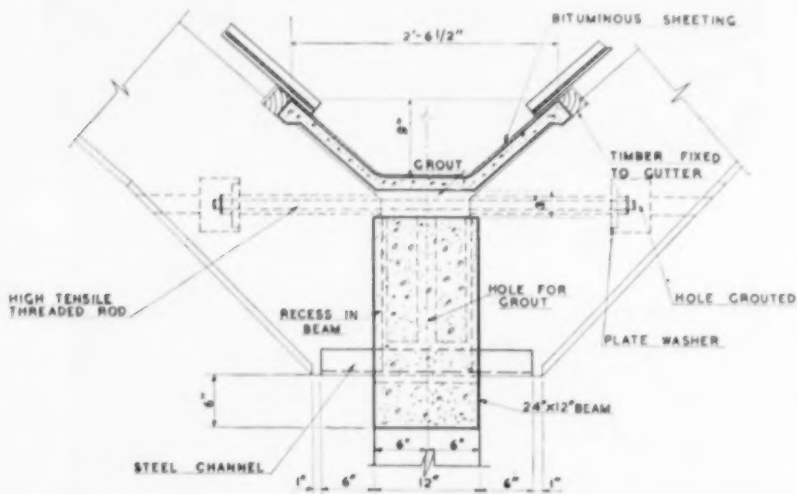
Detail at Junction of Roof Members at Valleys between Bays.
